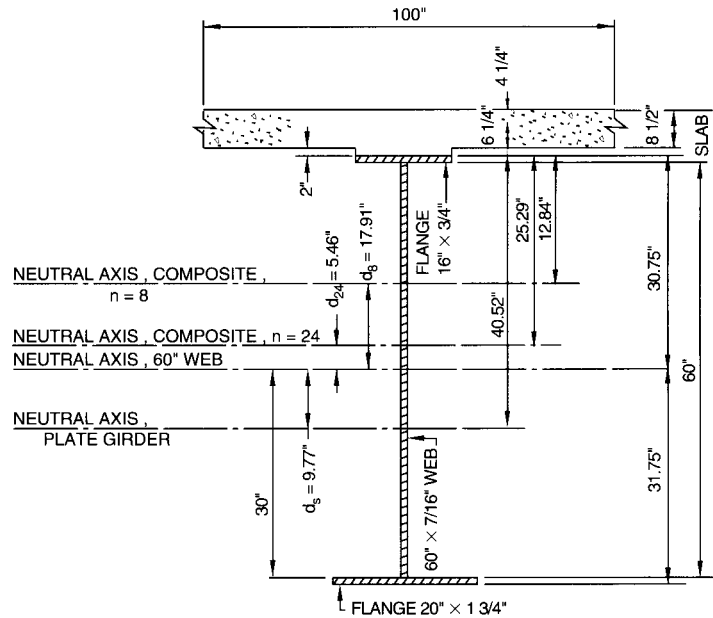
Cross section of composite plate girder about 30 ft from the supports.
